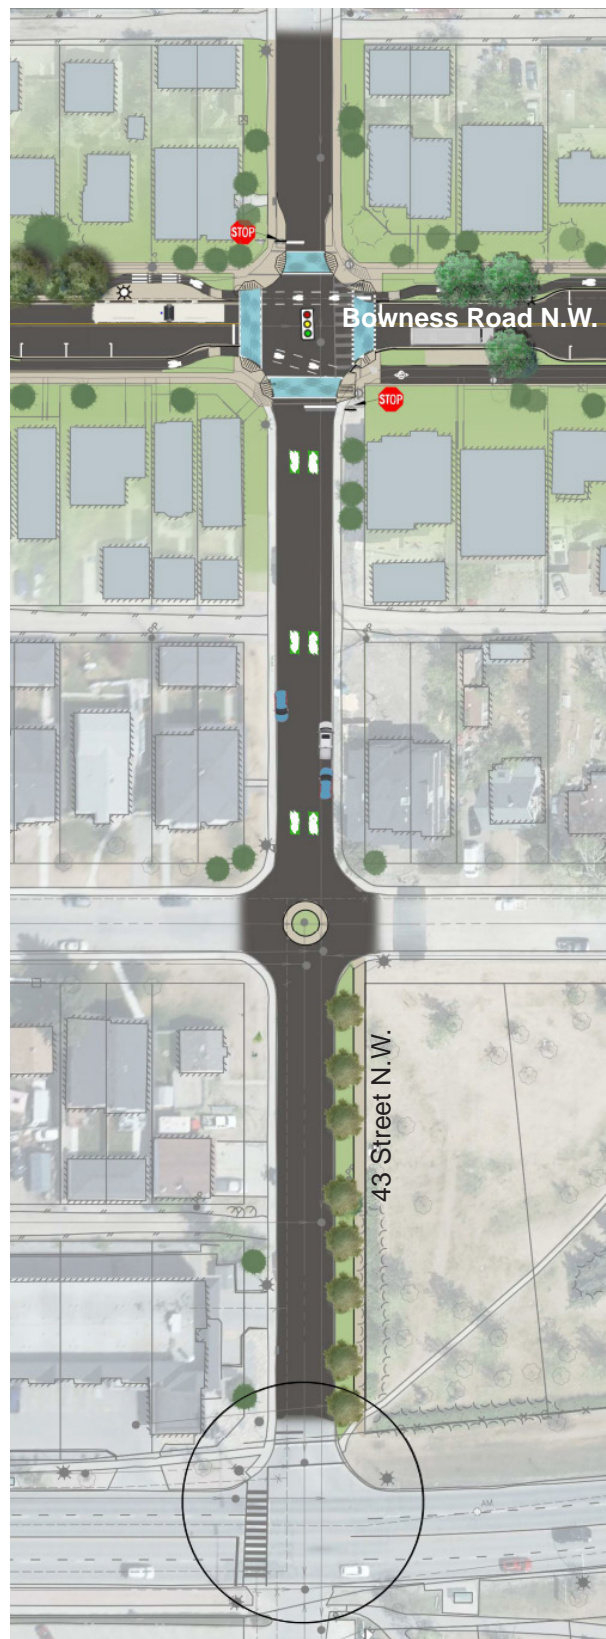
43 STREET N.W. DESIGN CONCEPT
